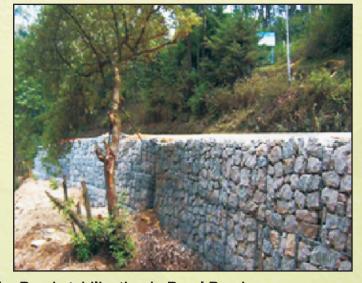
&b : Gabion Retaining wall for Road stabilisation in Rural Roads
